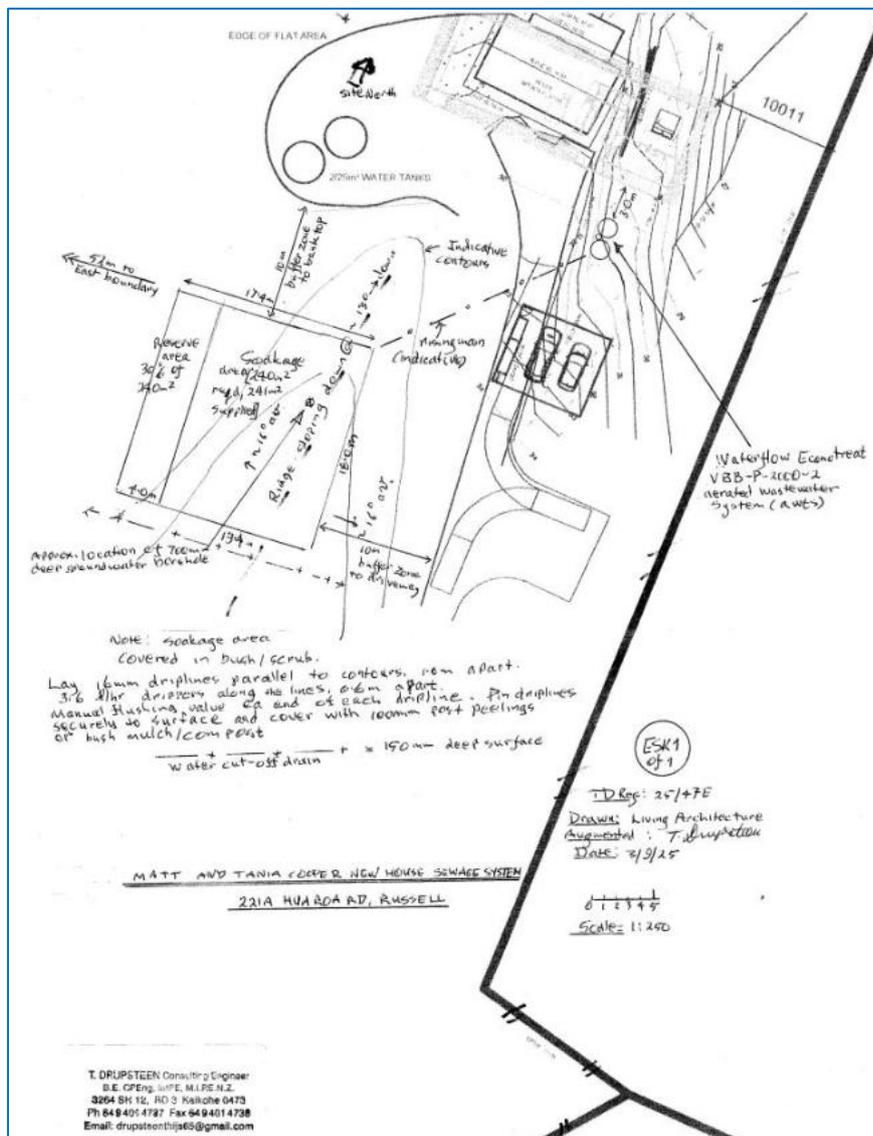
Wastewater Site Plan (Source: T. Drupsteen Consulting Engineer On-site Wastewater Disposal Site Evaluation Investigation Checklist).
